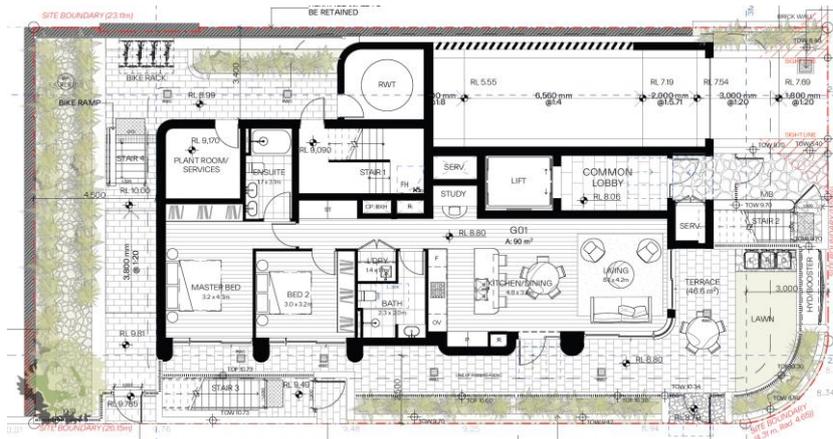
Proposed ground floor plan – 8 Ormond Gardens, Coogee (Source: PBD Architects)
